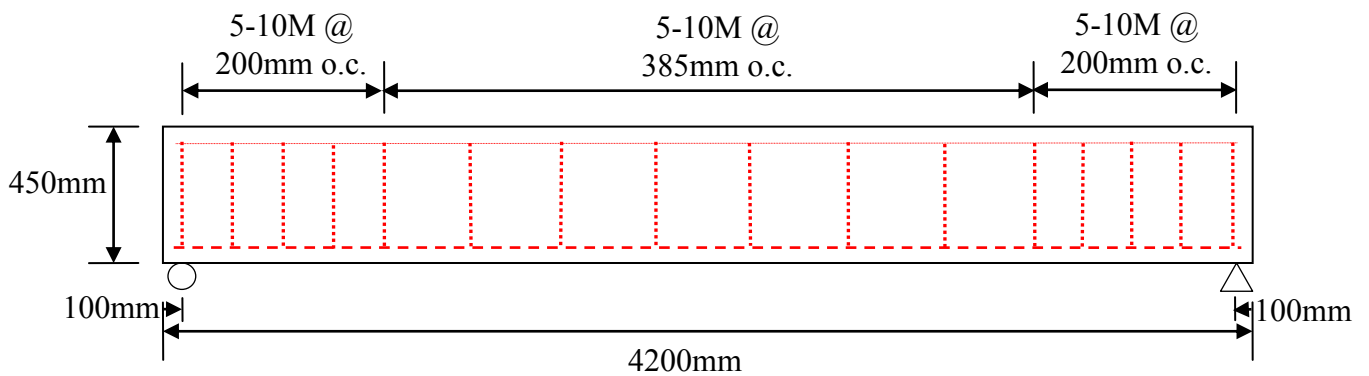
RB3 overall dimensions and stirrup locations, elevation view
